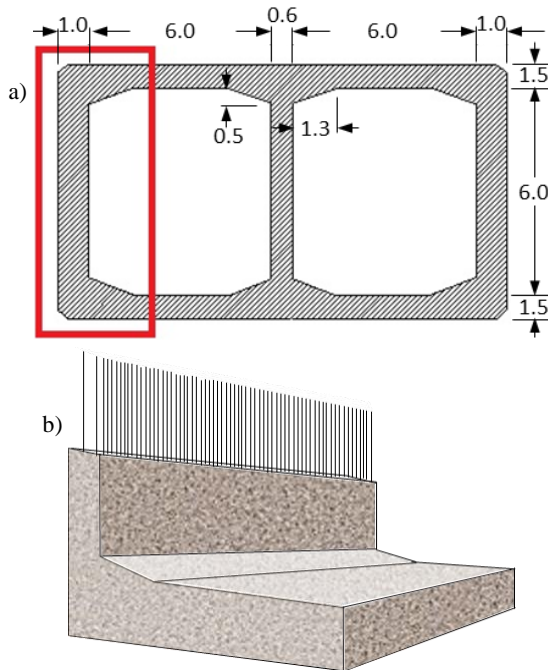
Tunnel dimensions: a) cross-section of the tunnel and dimensions; b) tunnel perspective.
